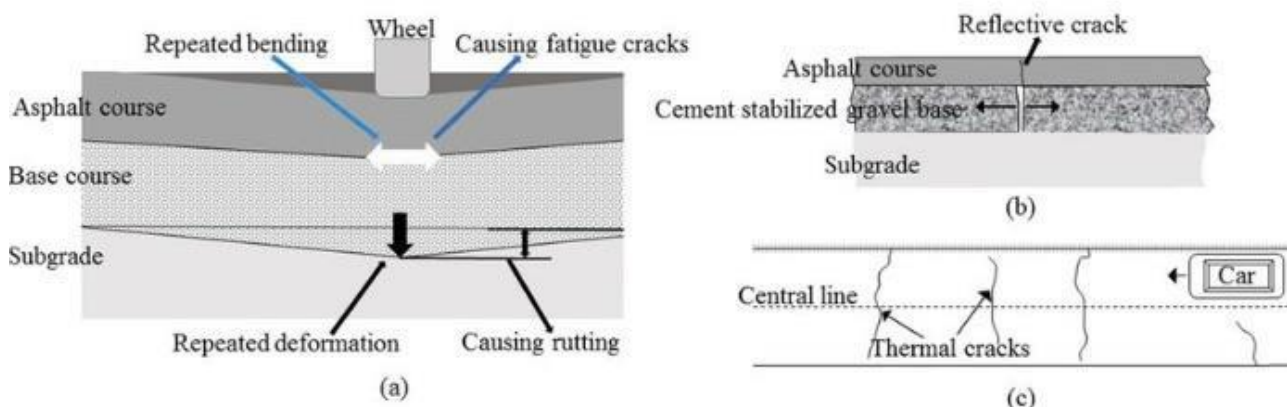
Various kinds of cracks developed in asphalt pavements. (a) Fatigue cracks; (b) reflective crack; (c) low temperature induced shrinkage cracks
